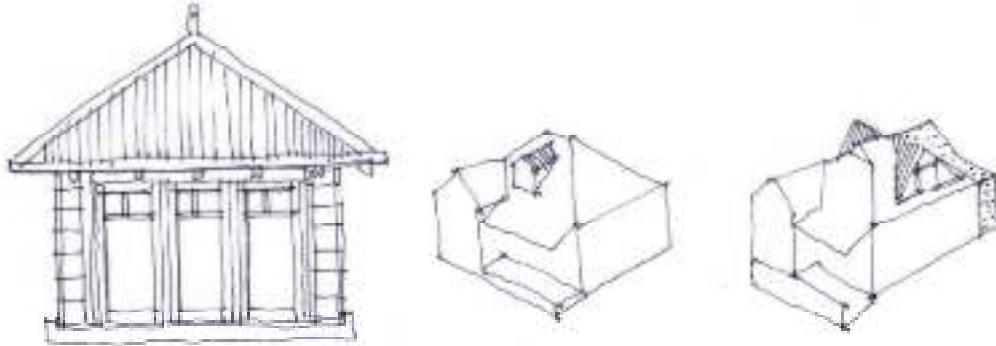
Roof extensions provide light and ventilation and use traditional details without overwhelming the scale and form of the main building.
